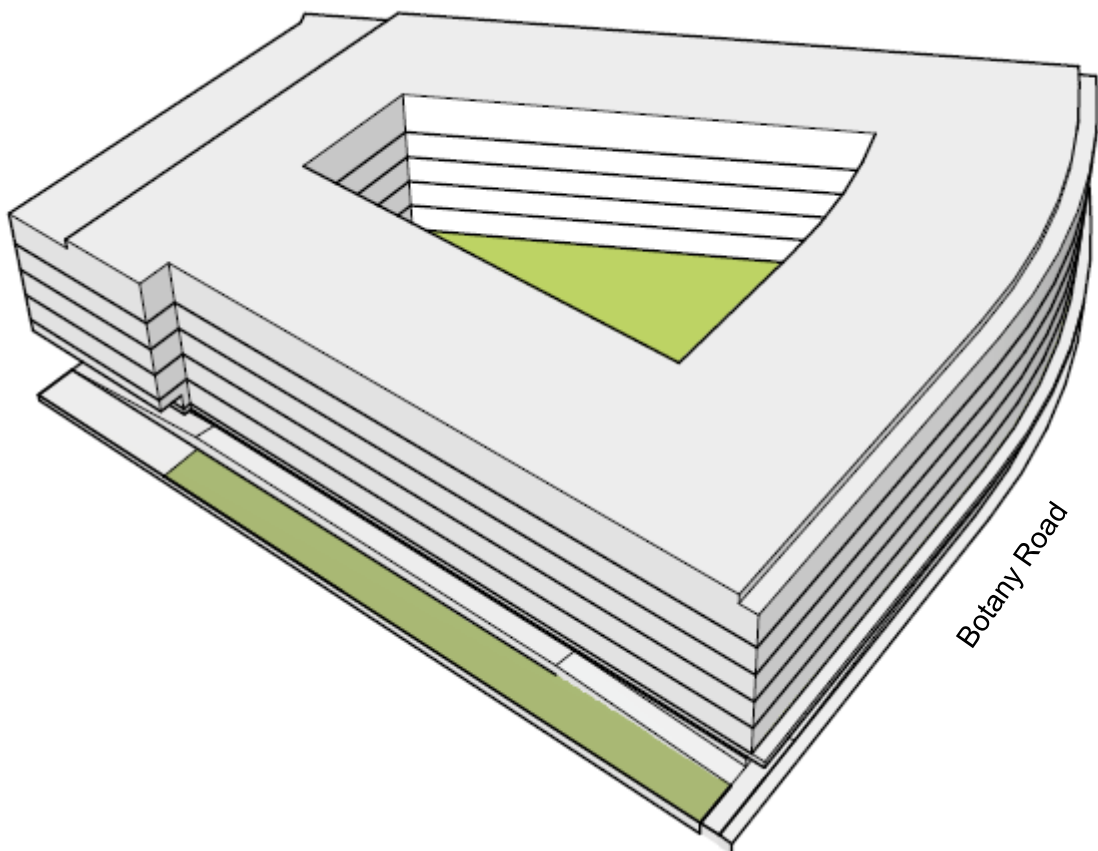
3D Massing of the proposal viewed from Botany Road and the southern elevation.
